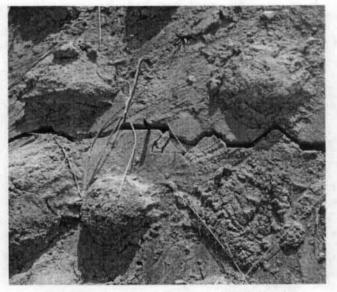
Crack in concrete CMP outfall, the writing pen placed in the crack indicates the depth of the crack.
